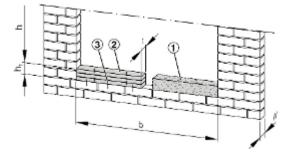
Installation opening with concrete or calcium silicate boards for height adjustment
